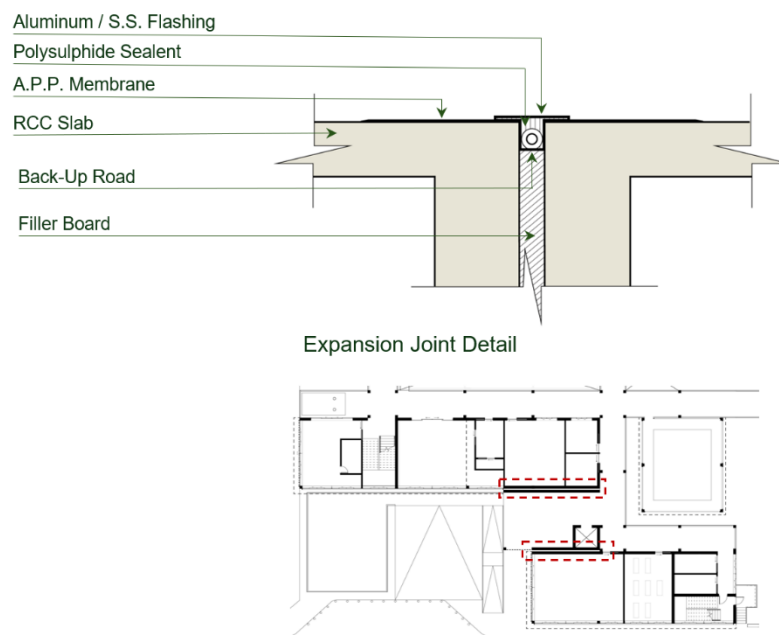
Detail Drawing of Expansion Joints with Location in Plan (Source: drawn by author)
